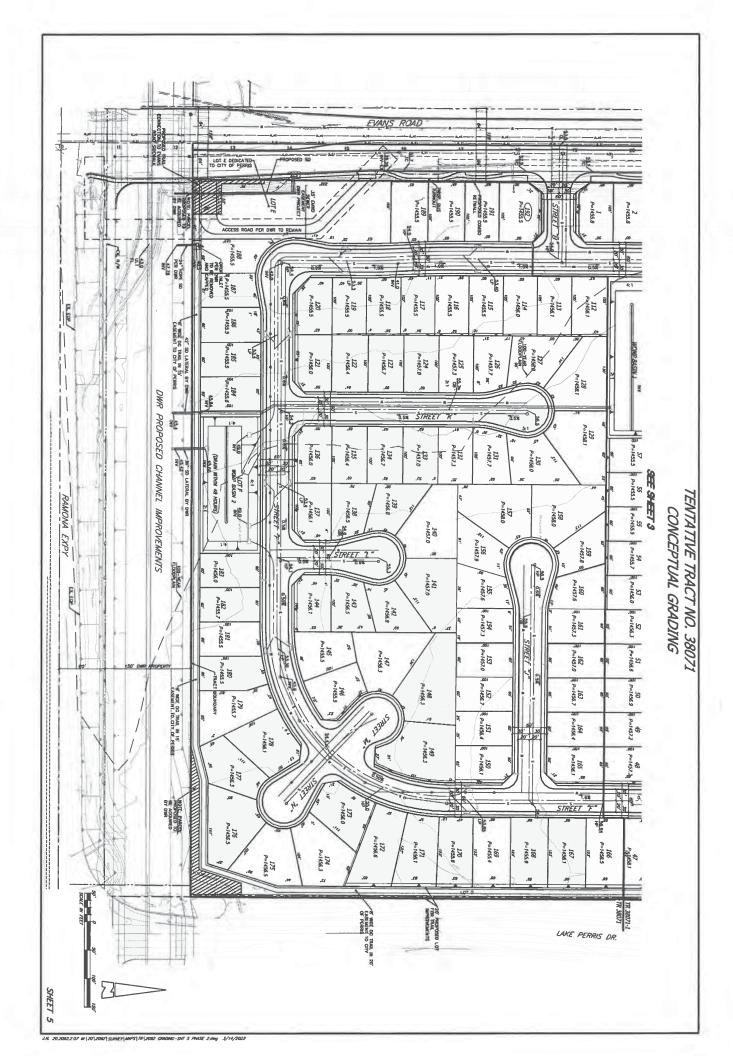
and TTM38071-1 plans and conceptual landscape plans
